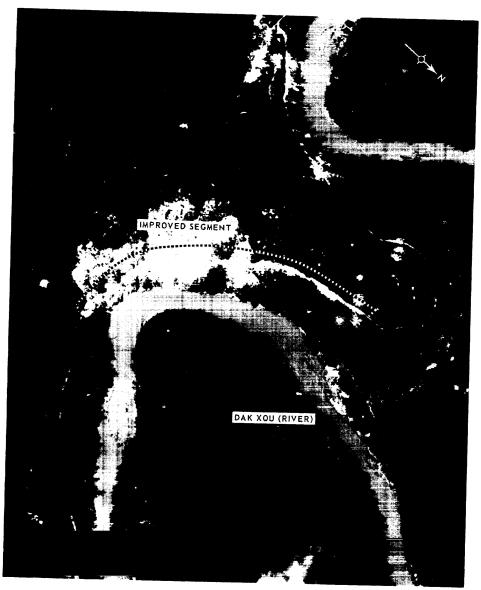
ROAD RECONSTRUCTION, ROUTE 110, LAOS
